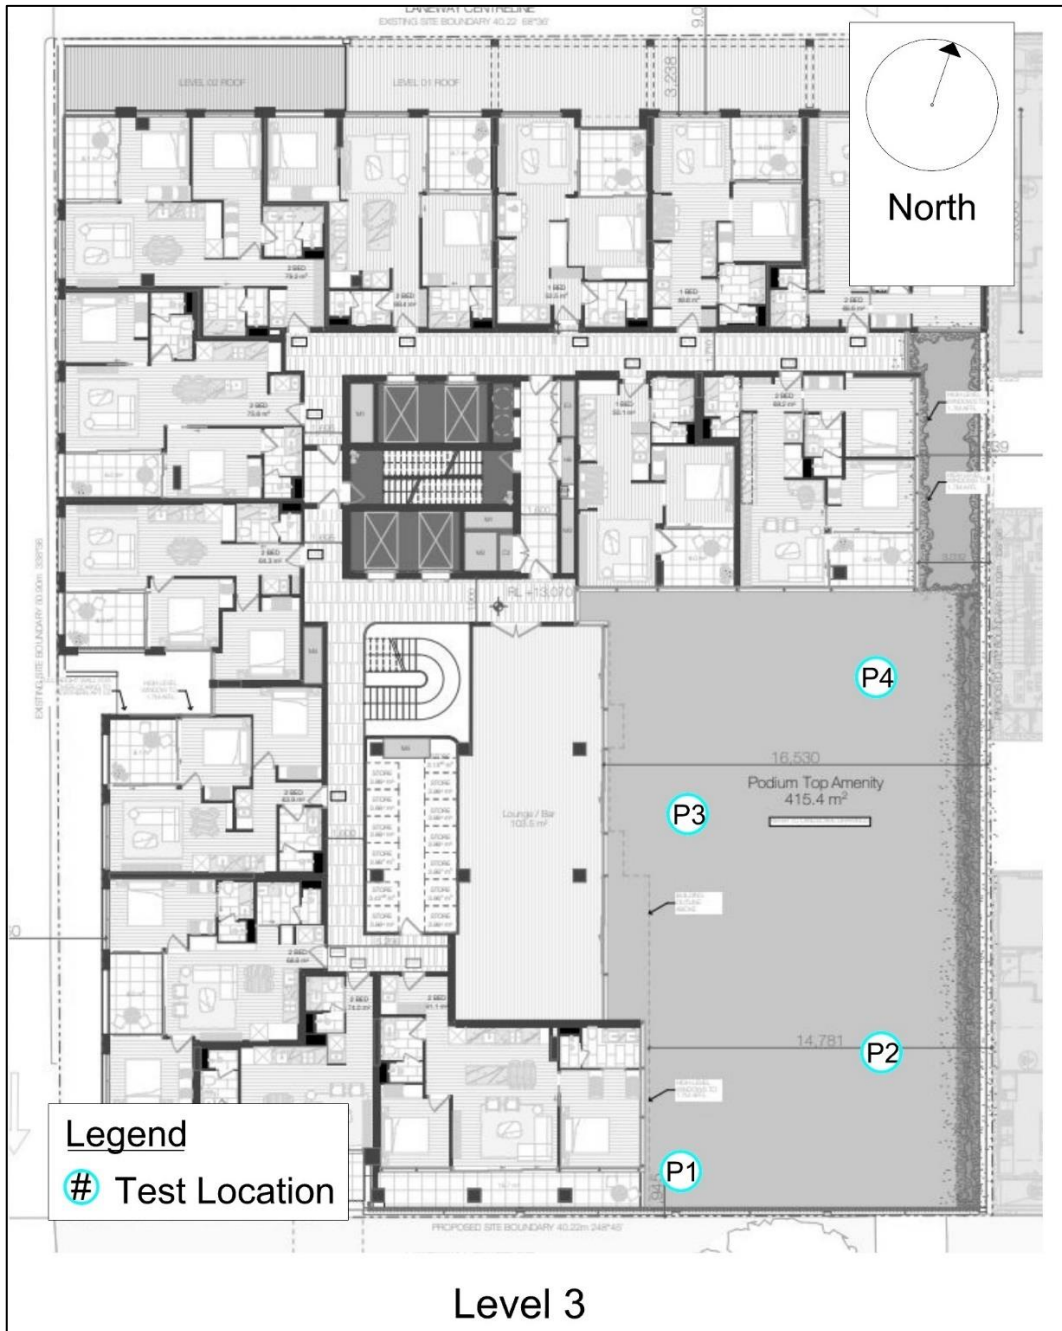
Test Locations on Level 3 of the proposed 60-70 Park Street development.
